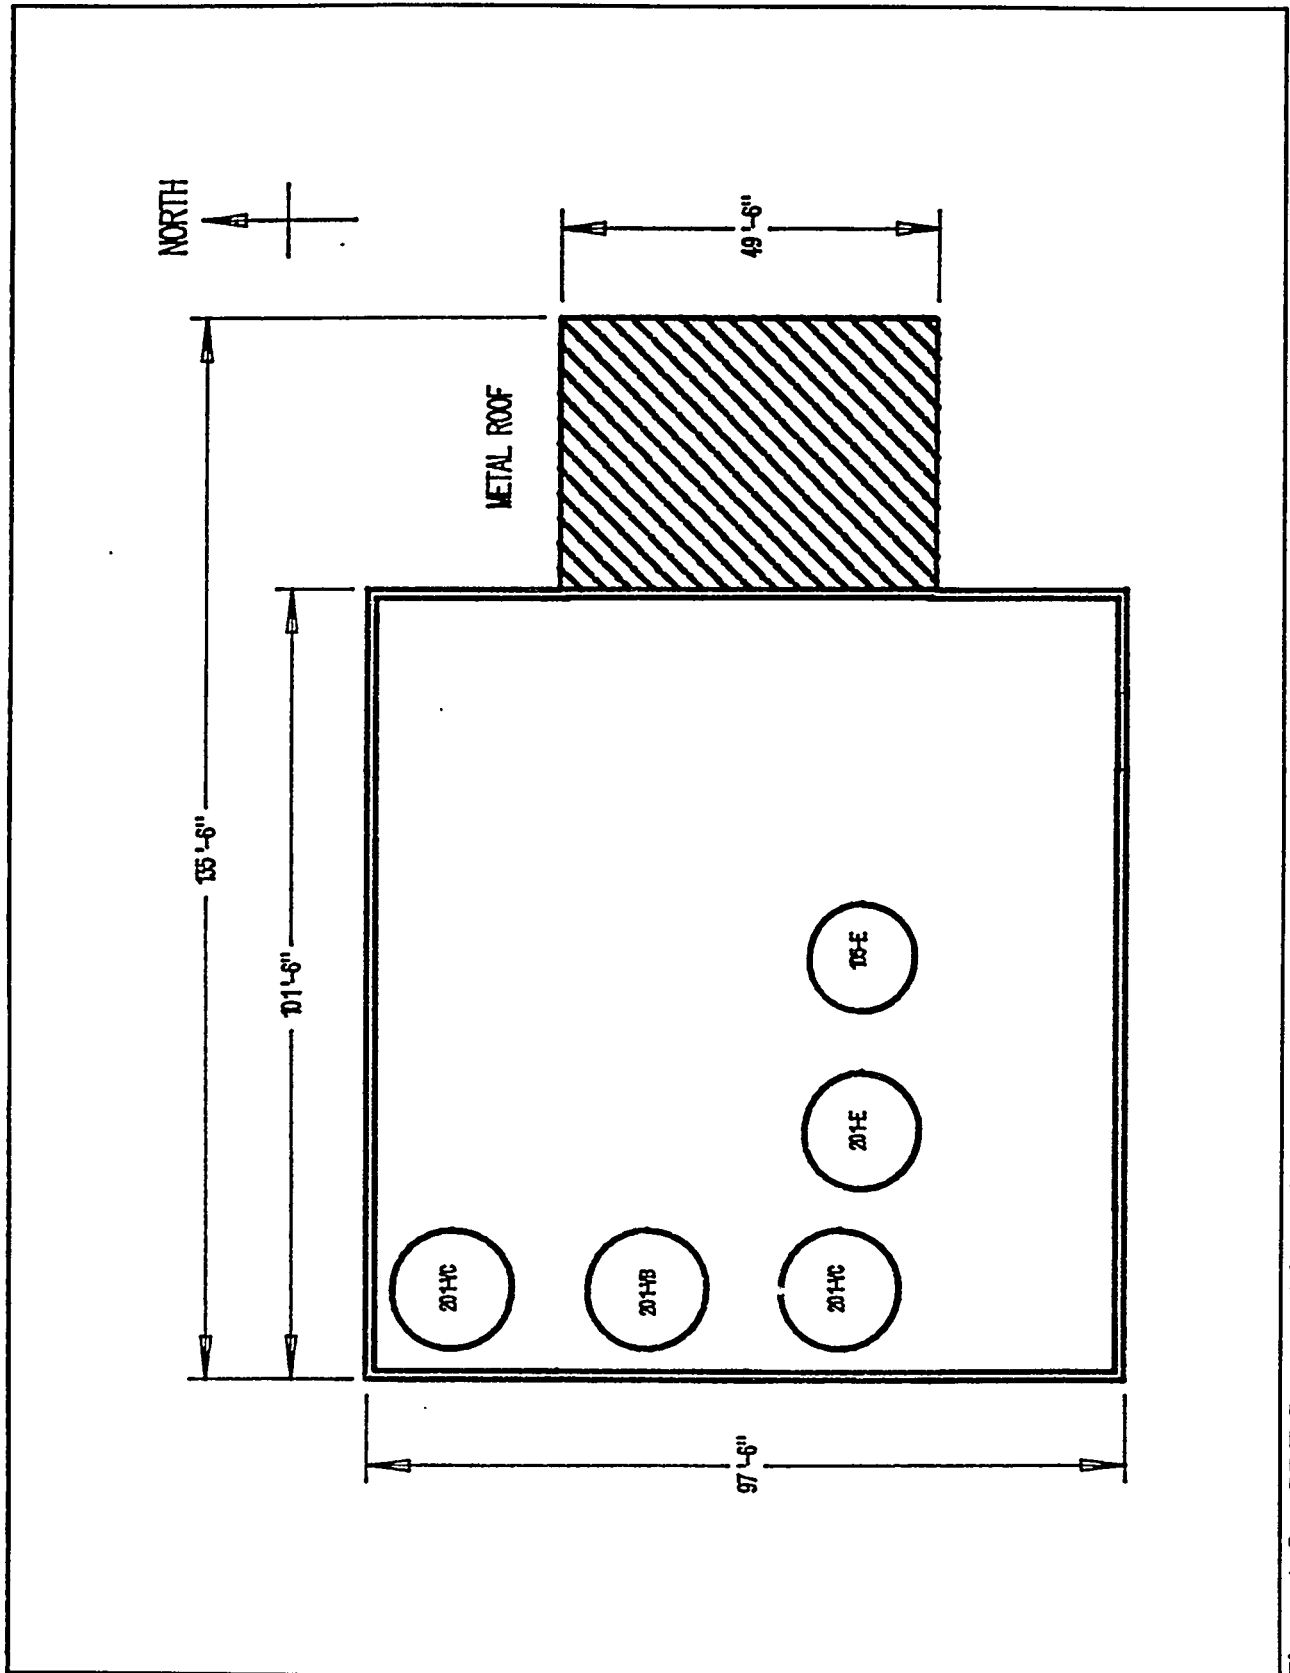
PDF Structure Floor Plan (Elevation 142'-6")
